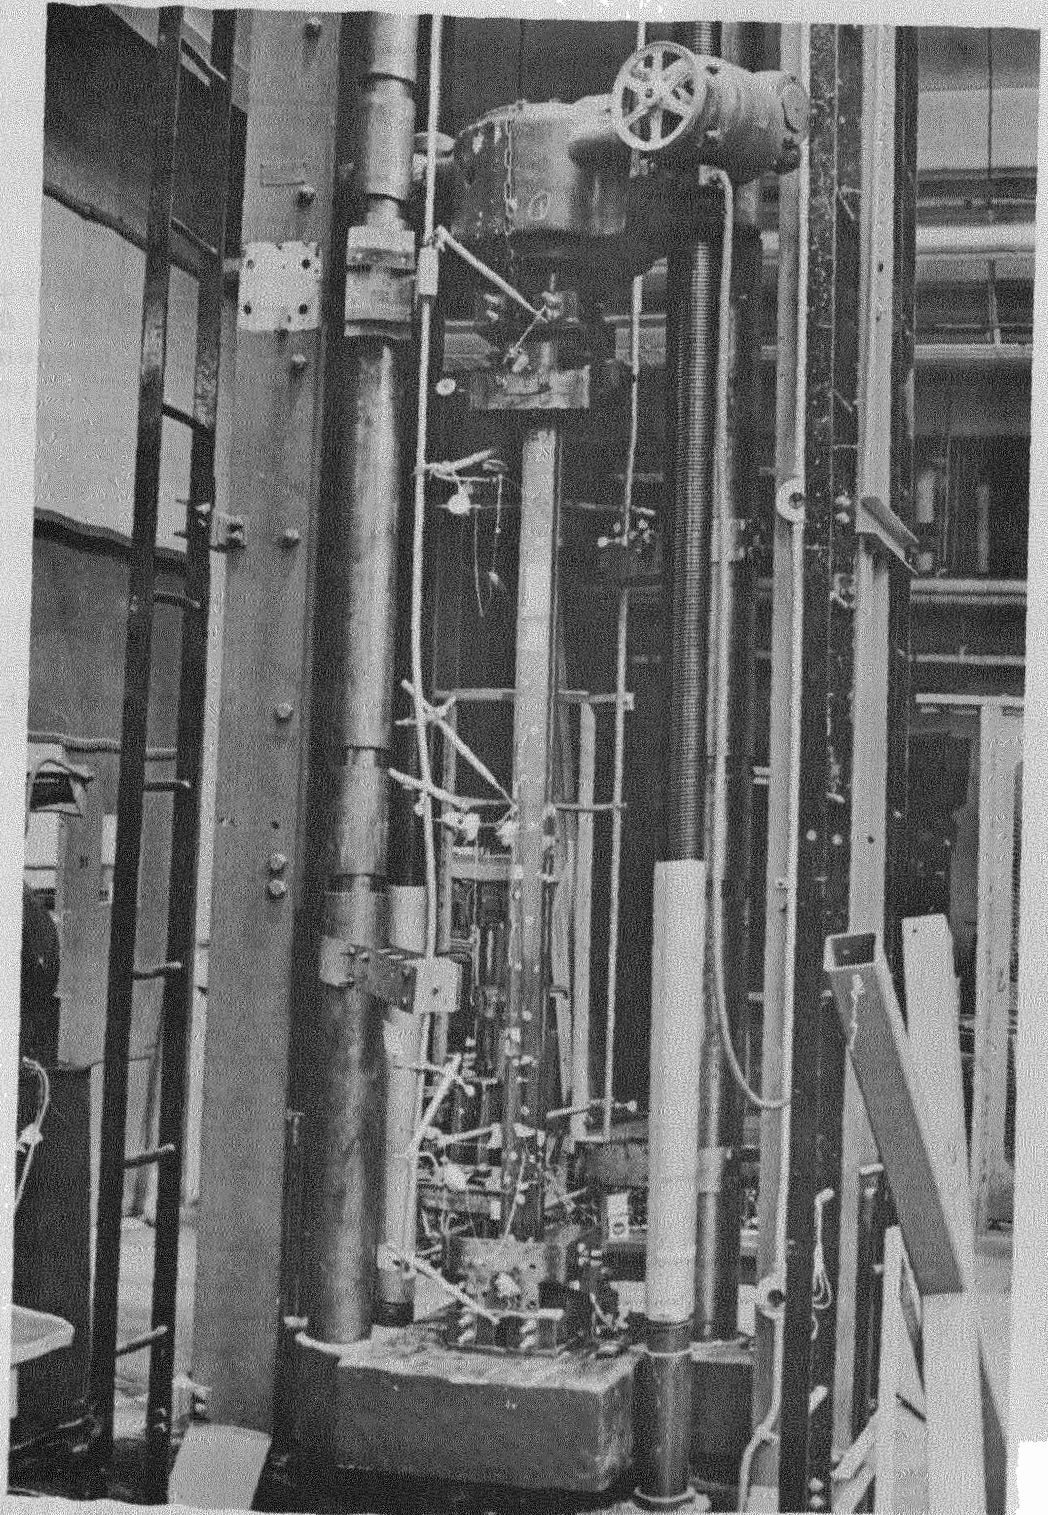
COMPRESSION MEMBER TEST SET-UP
